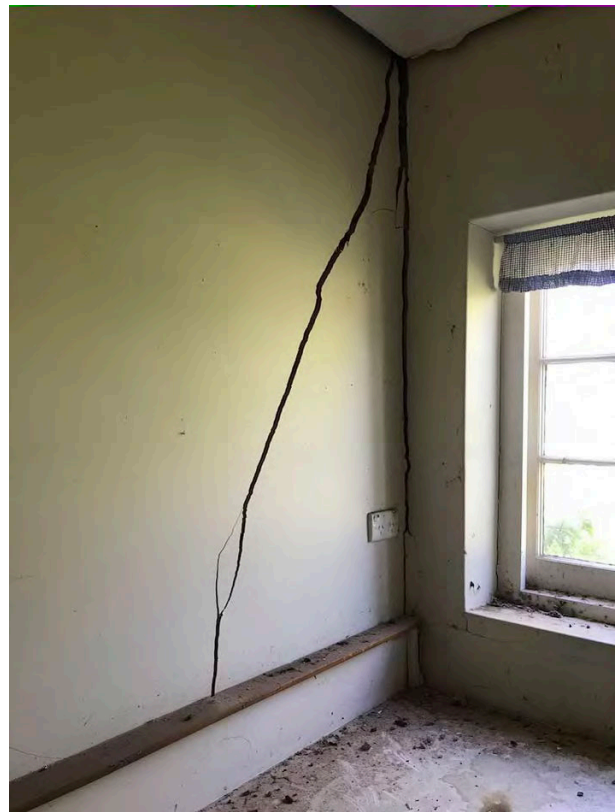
Cracking to masonry walls and interior of (former) kitchen wing
